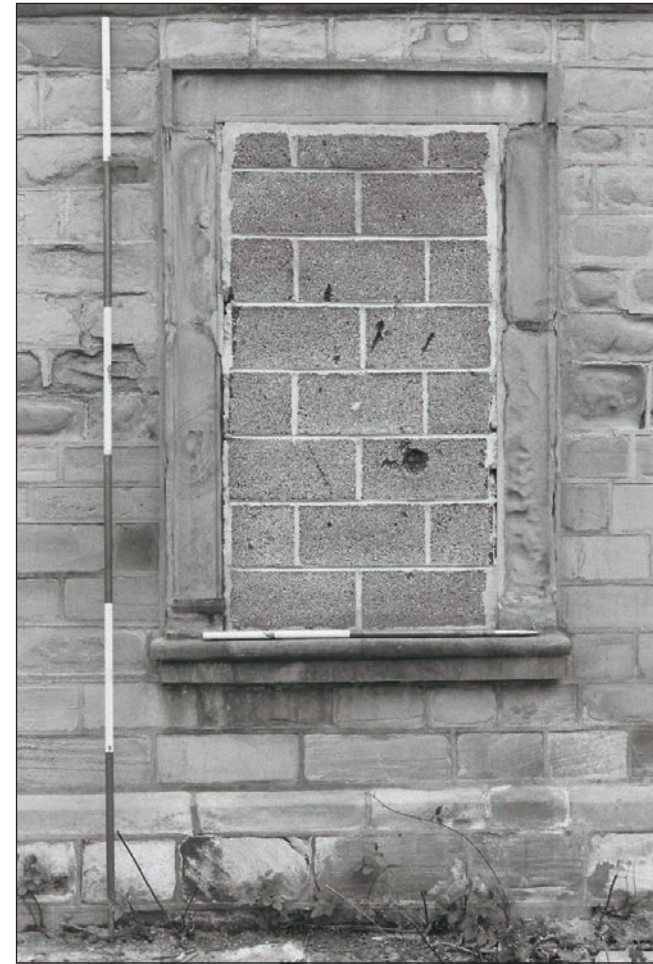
Detail of ground floor window, west elevation of Building 4 (Film 06.22)
